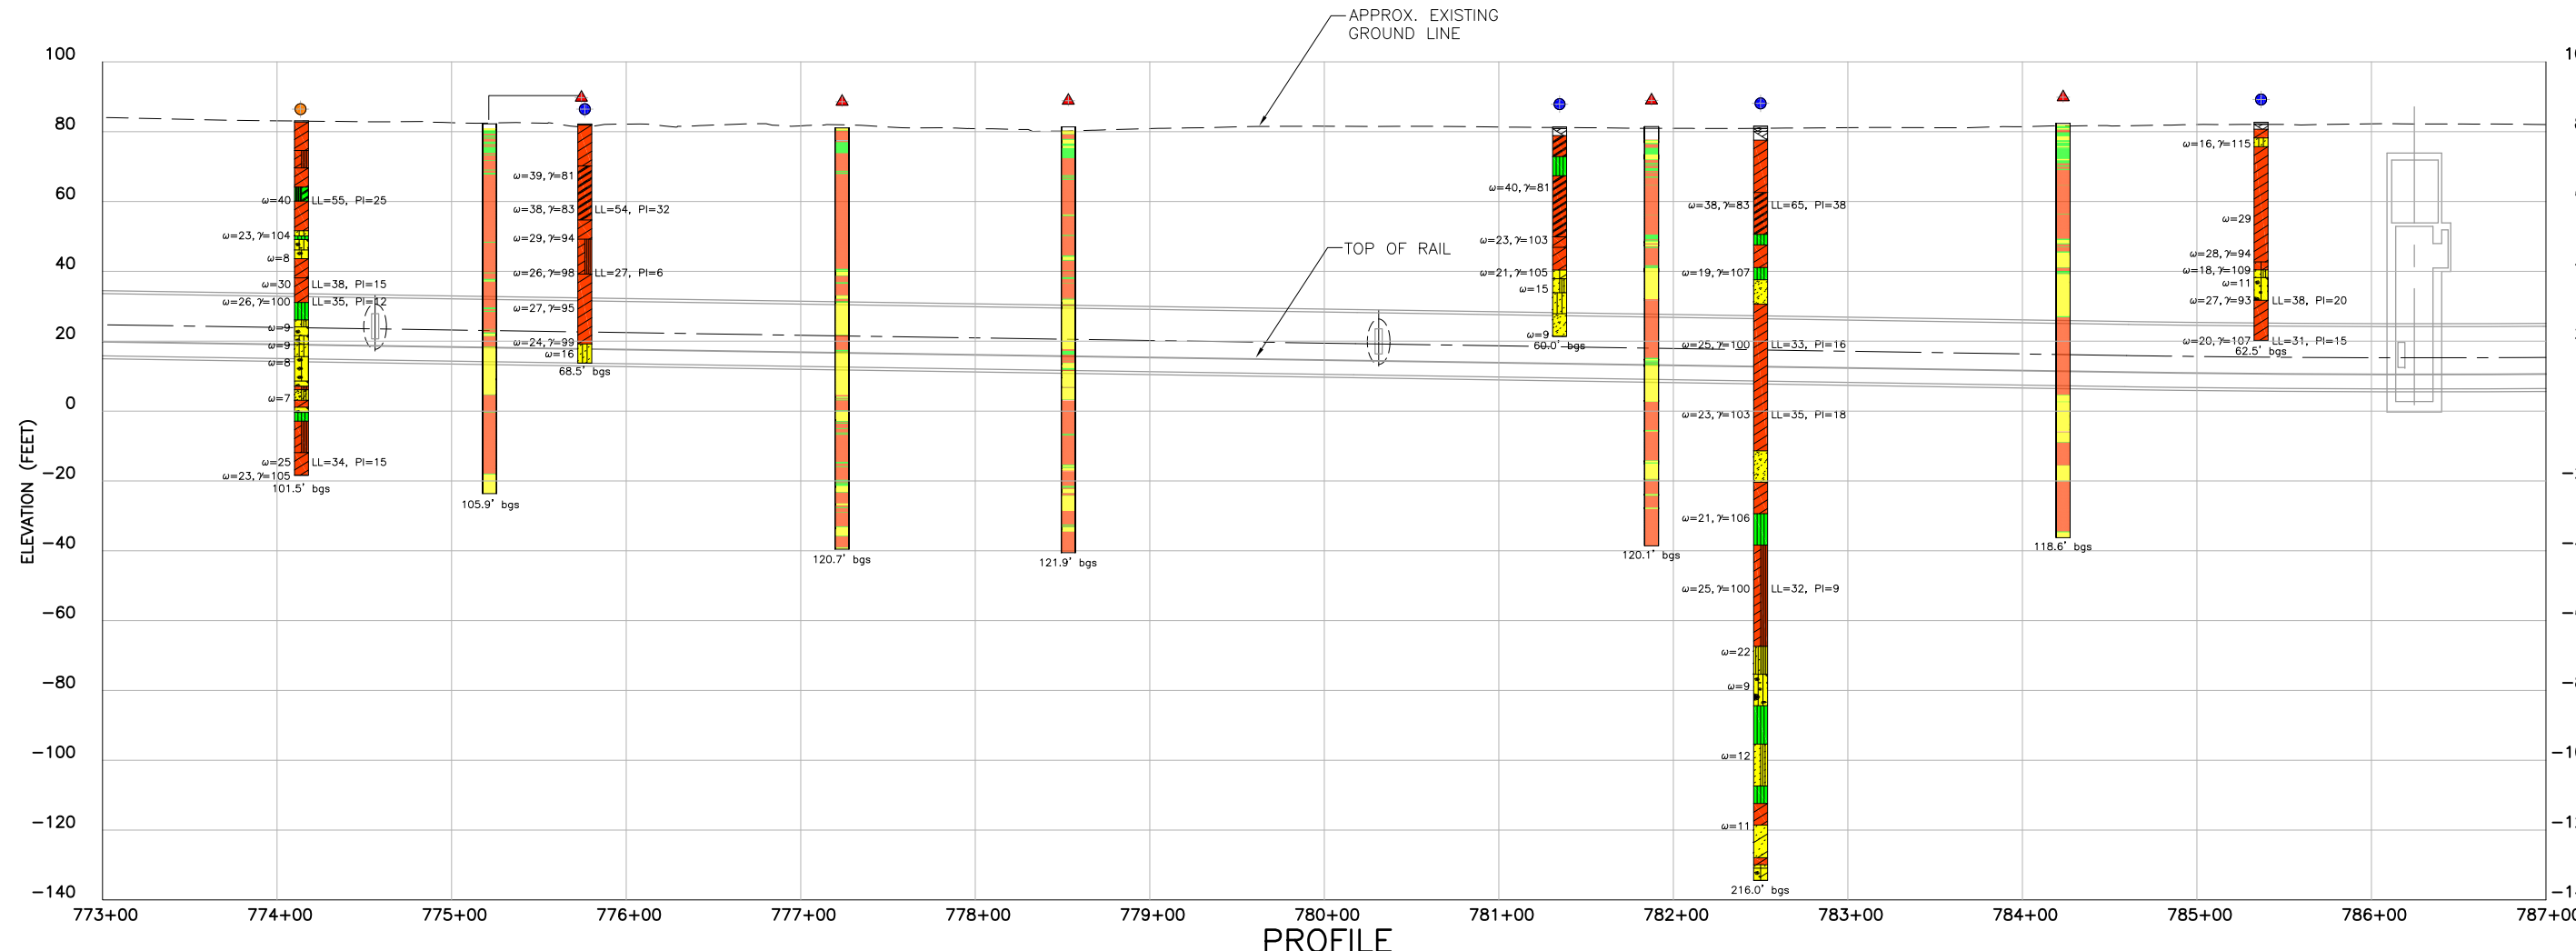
Geotechnical Plan and Profile with Classification Test
